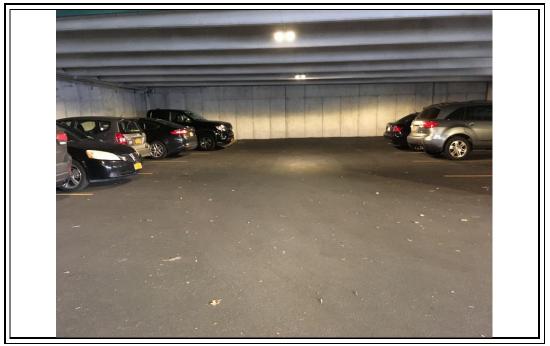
Looking north-northeast; asphalt cover in northwest portion of parking garage.
